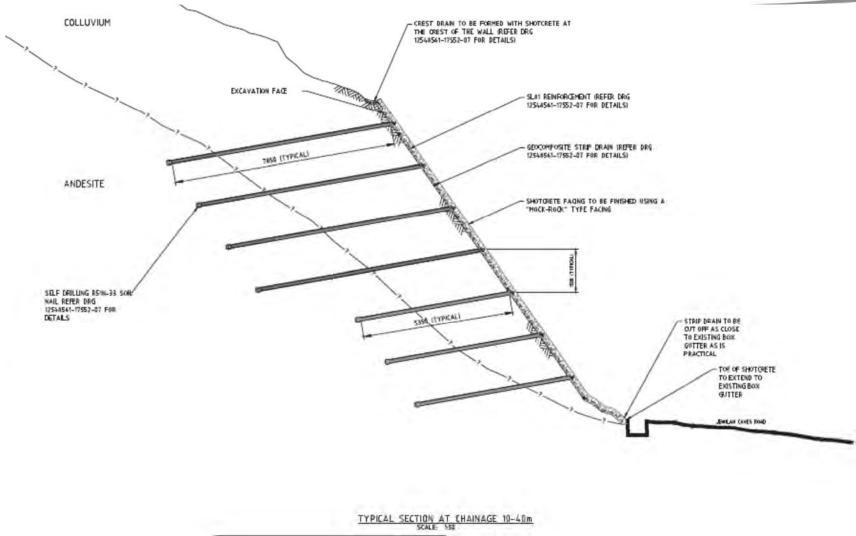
1. Typical section of the failed slope showing proposed soil nails and shotcrete finish (Source: TfNSW, Drawing No 12548561–17551-04 Drawn on 14/10/2021).
